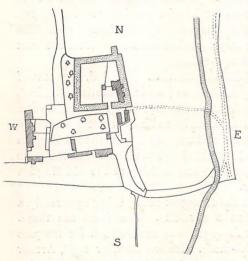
FIG. XIII.—PLAN OF MOAT, BUILDINGS, ETC., AT NEW HALL.
